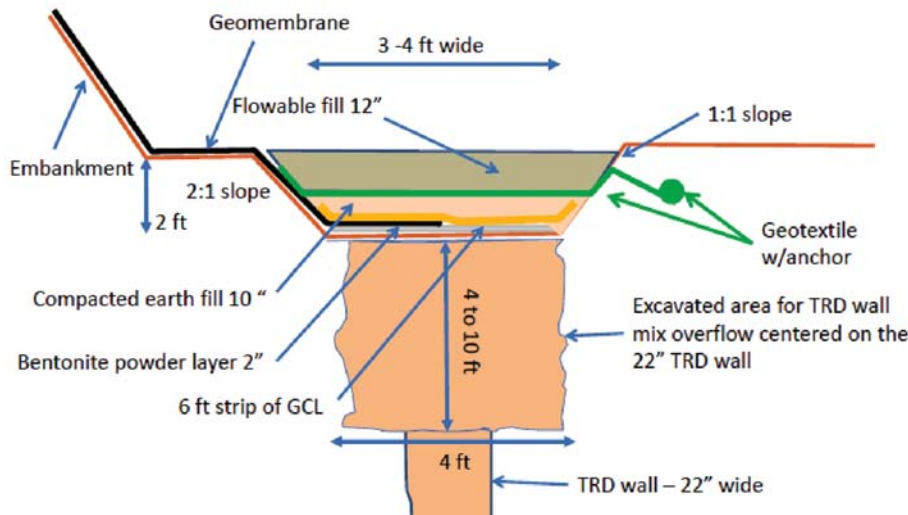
Trench Remixing and Cutting Deep Wall (TRD) – Geomembrane Connection
